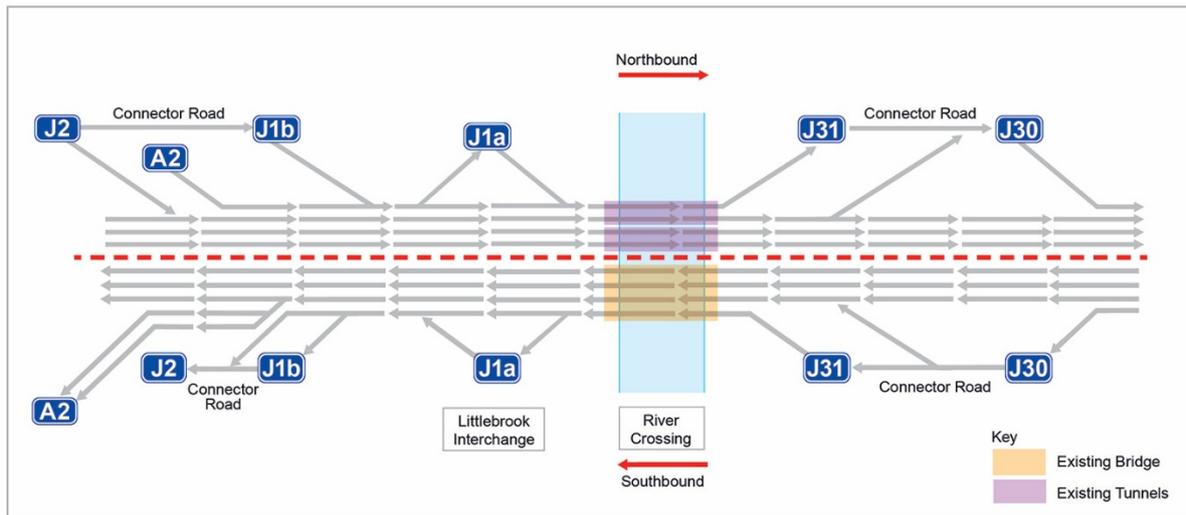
EXISTING A282 LANE LAYOUT
